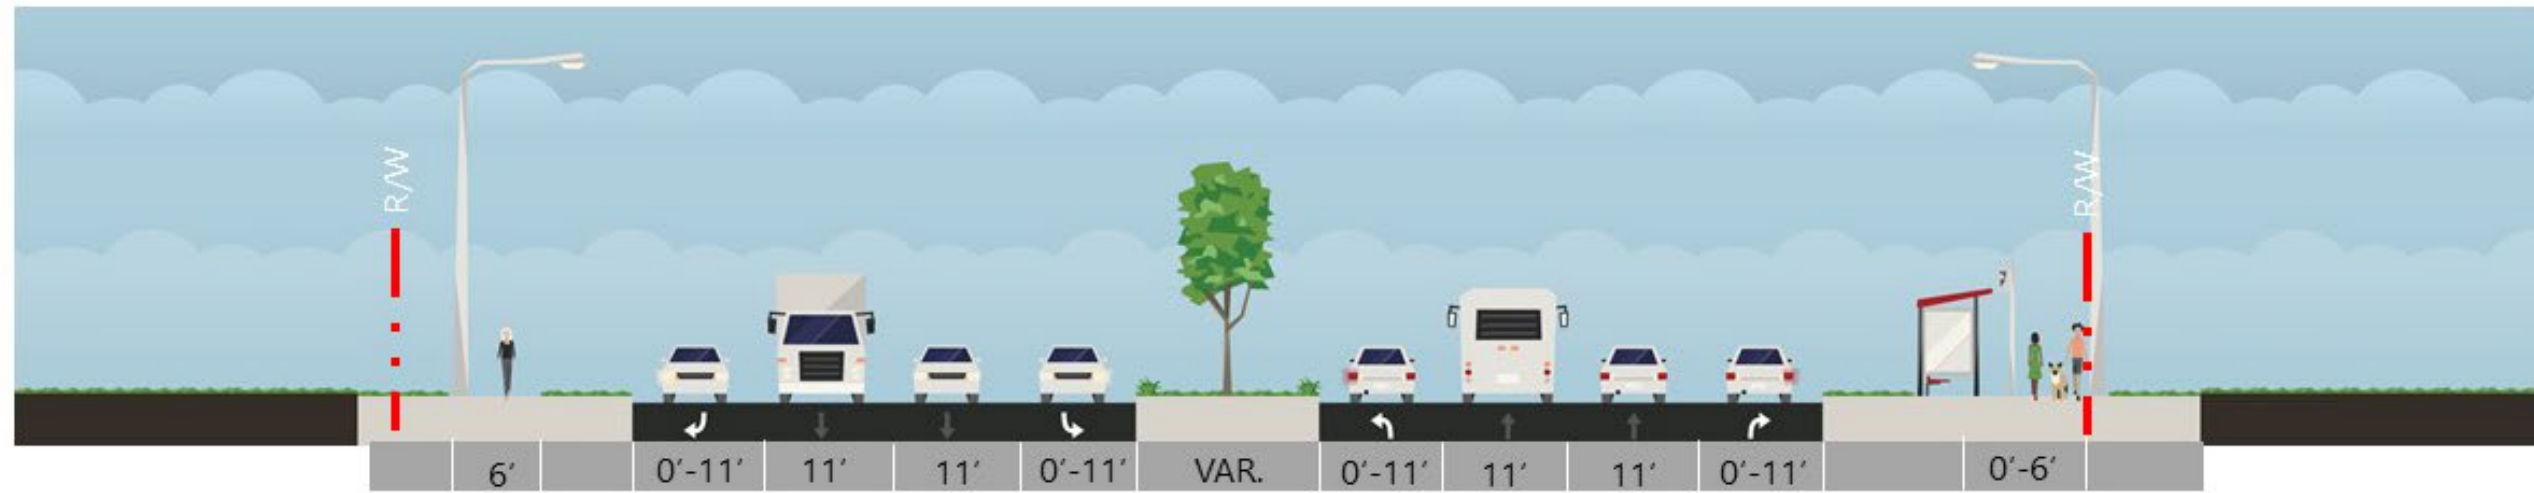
NW/SW 136th Avenue Typical Section South of SR 84
